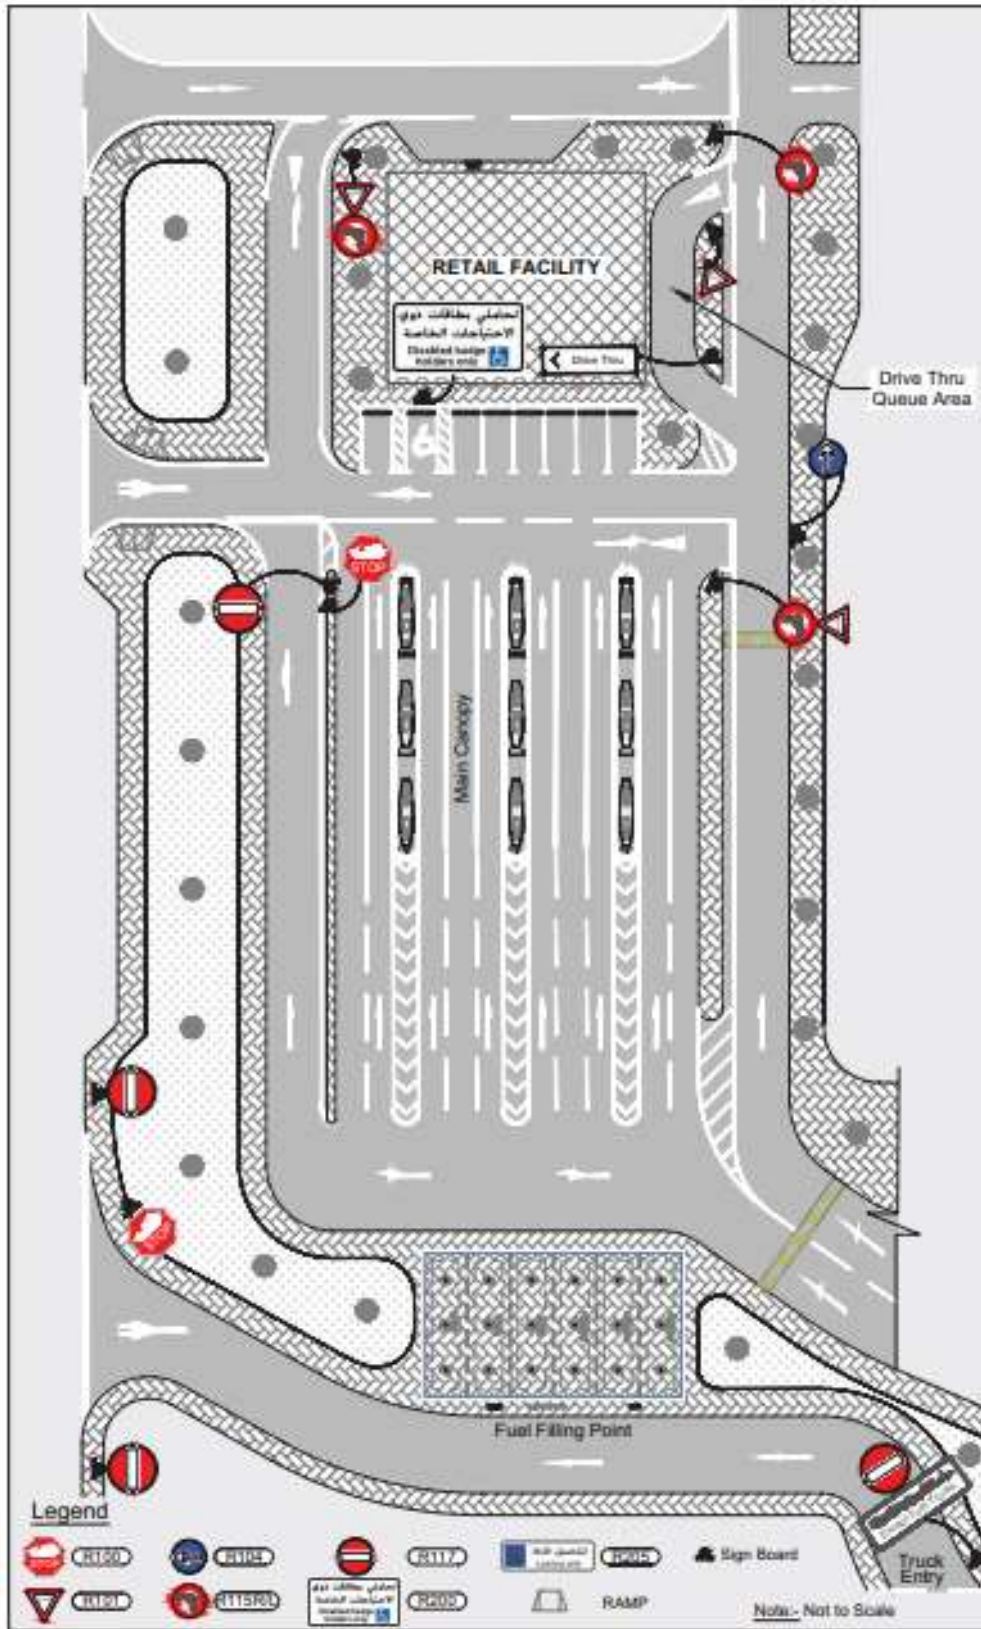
Typical Petrol Station with Retail Facilities Layout
